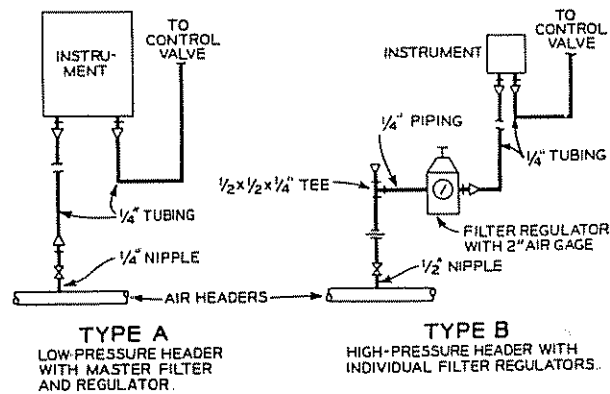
Piping for Controllers on Back of Instrument Panel.
